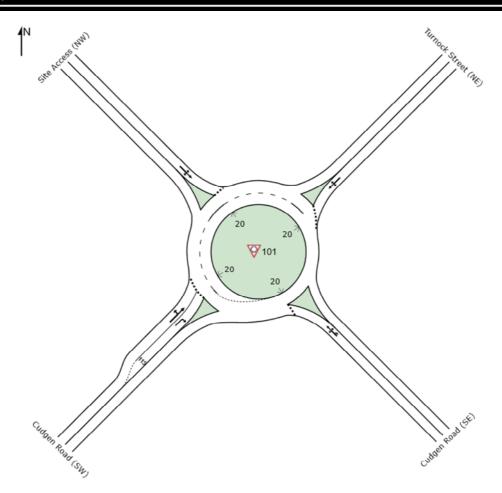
Cudgen Road / Turnock Street SIDRA Intersection Layout (With Access)
